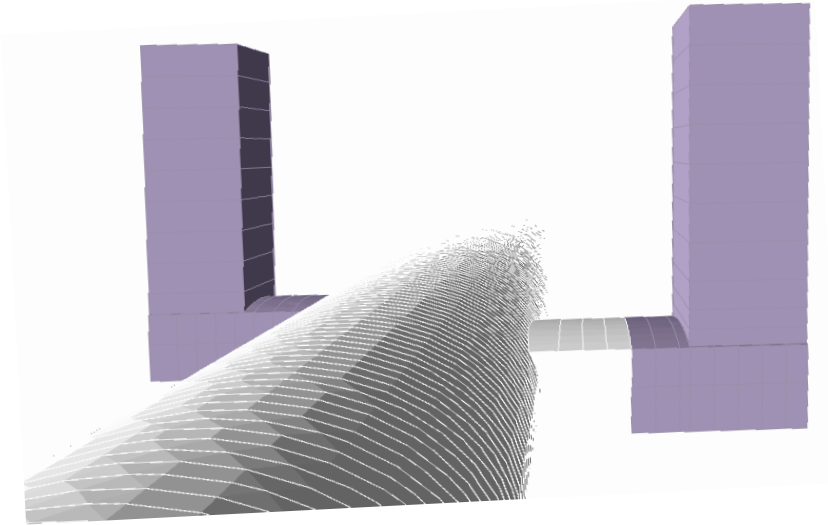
Example of the top heading & bench excavation for the cross-passage type (a) at stage 221
